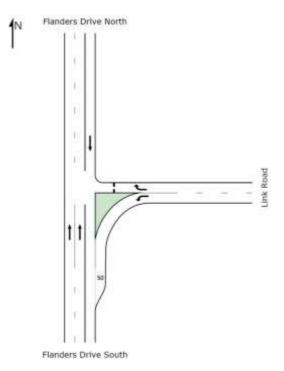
Future layout of the Flanders Drive/ Link Road Intersection
